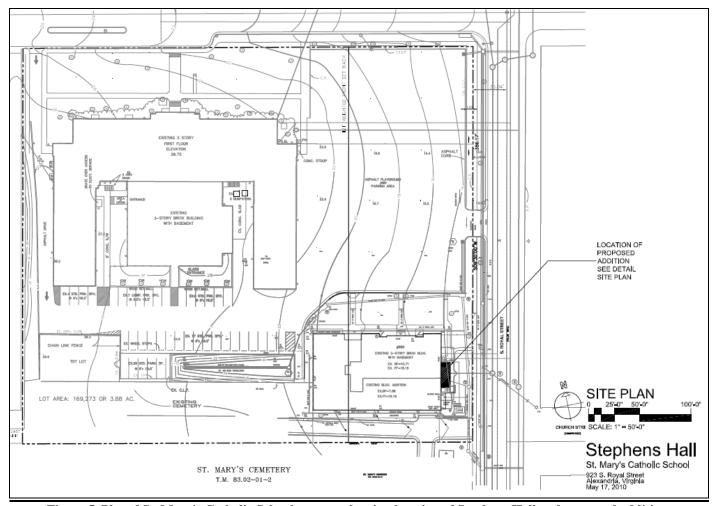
Plat of St. Mary's Catholic School campus showing location of Stephens Hall and proposed addition.
